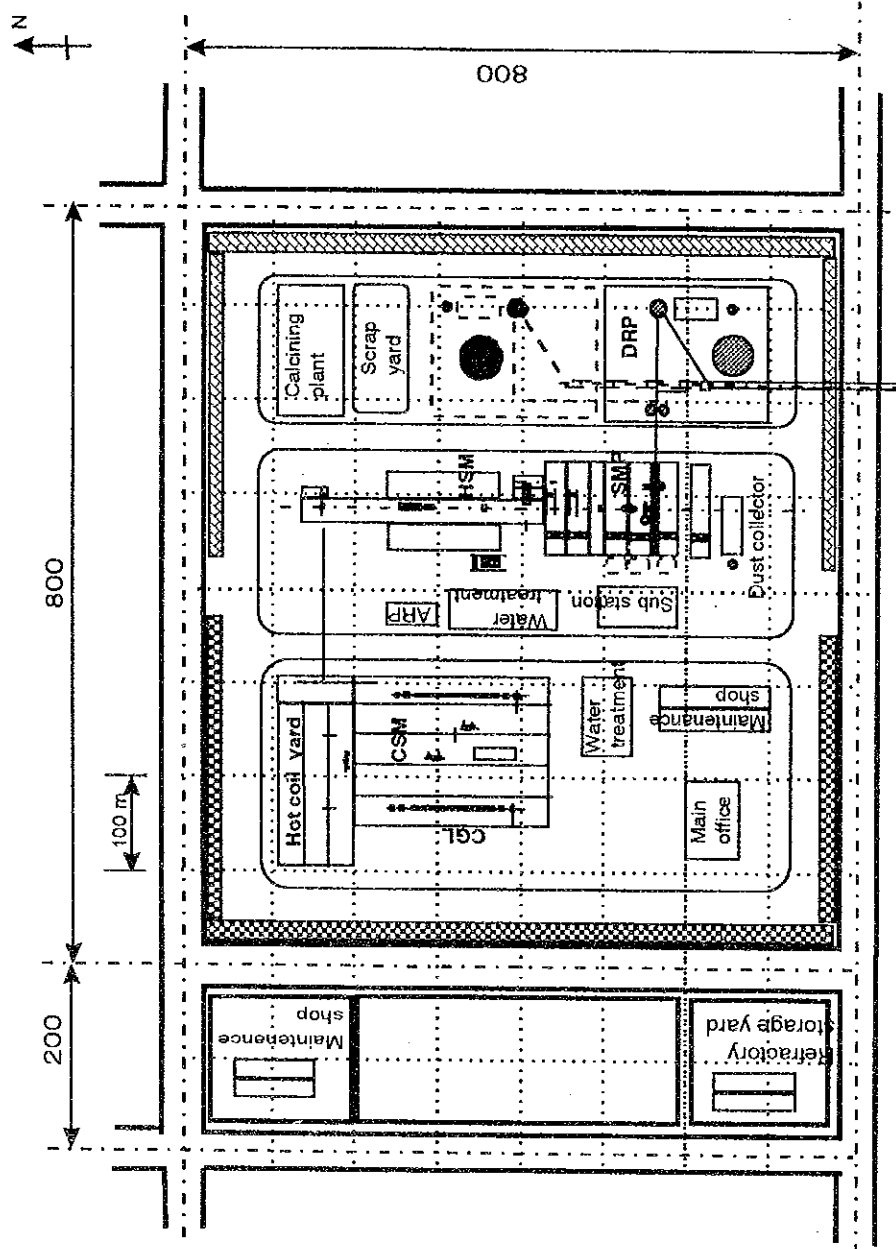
A-6-2 Plant site Elevation-Suez/Adabiya
